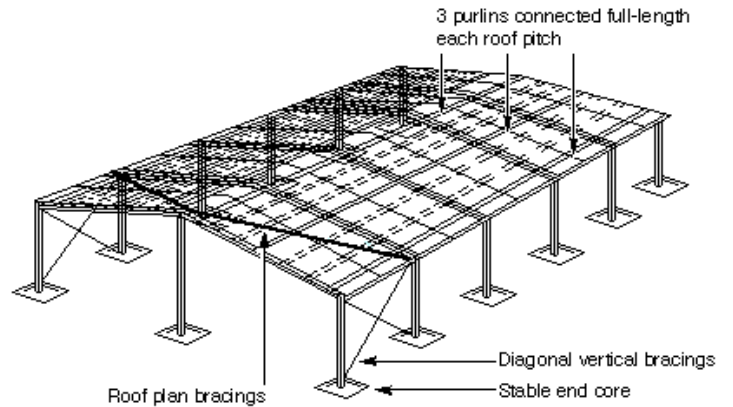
Typical steel-framed agricultural building showing preferred minimum erected elements to ensure temporary stability (stable end core)
